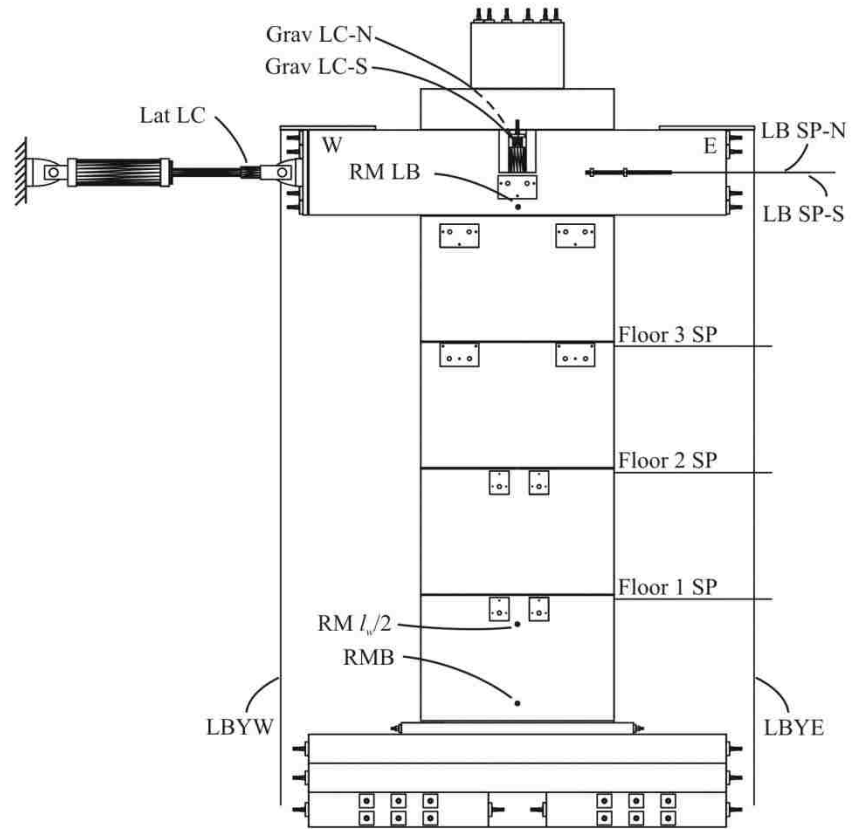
Global Instrumentation Plan (Perez et al. 2004)
